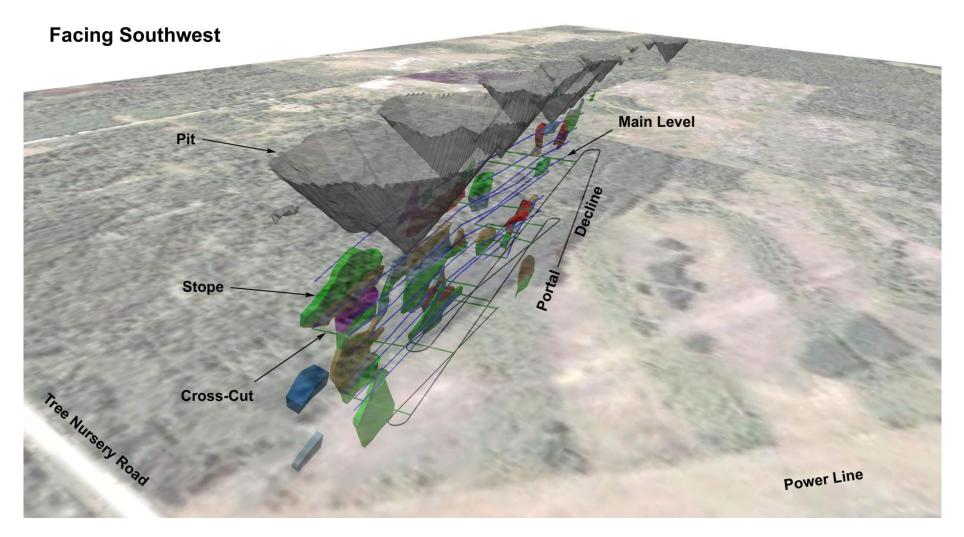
3D view of the proposed pit and underground workings, facing southwest.
